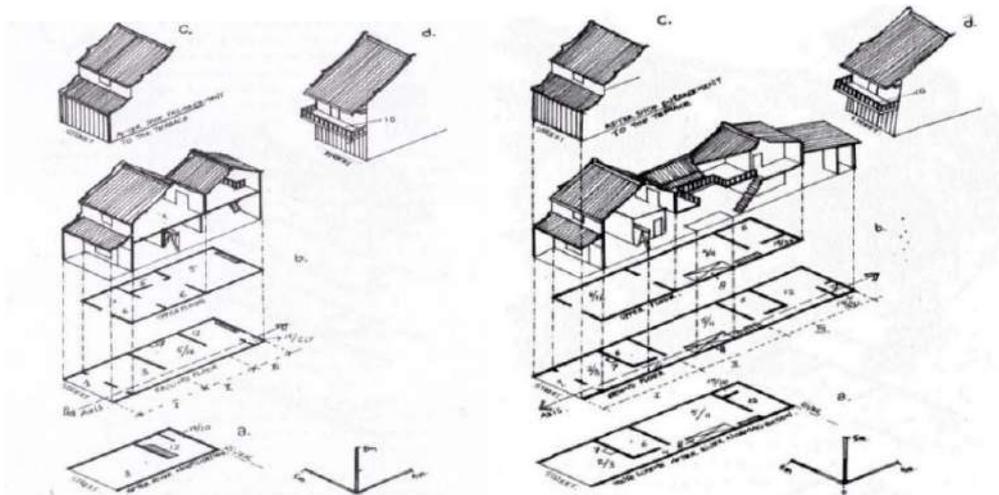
a) The type of Shop house with short footprint (2 floors)
